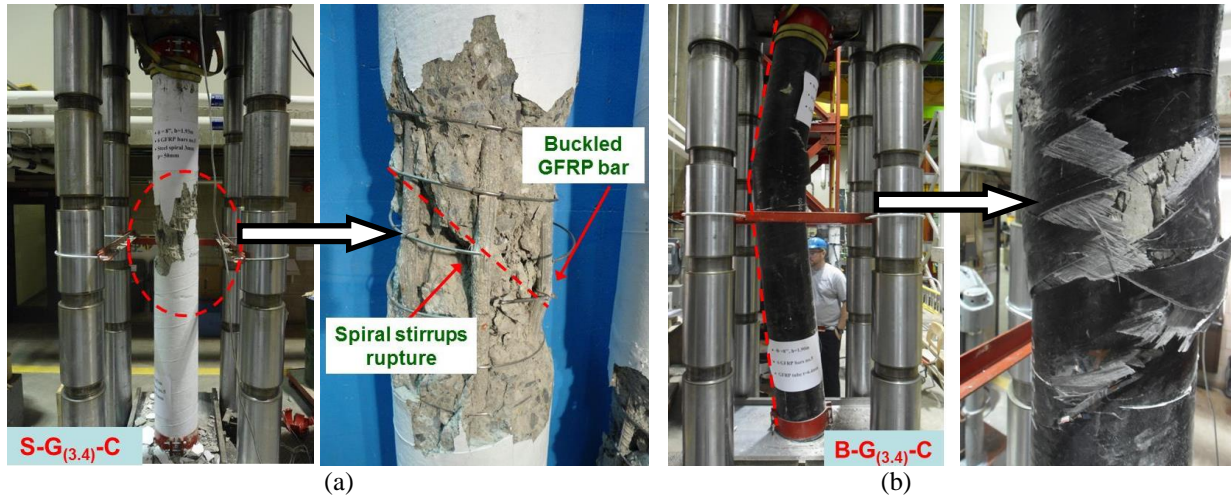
Typical mode of failure for the tested columns: (a) GFRP-reinforced control specimen; (b) GFRP-reinforced CFFT column confined with tube (B)
